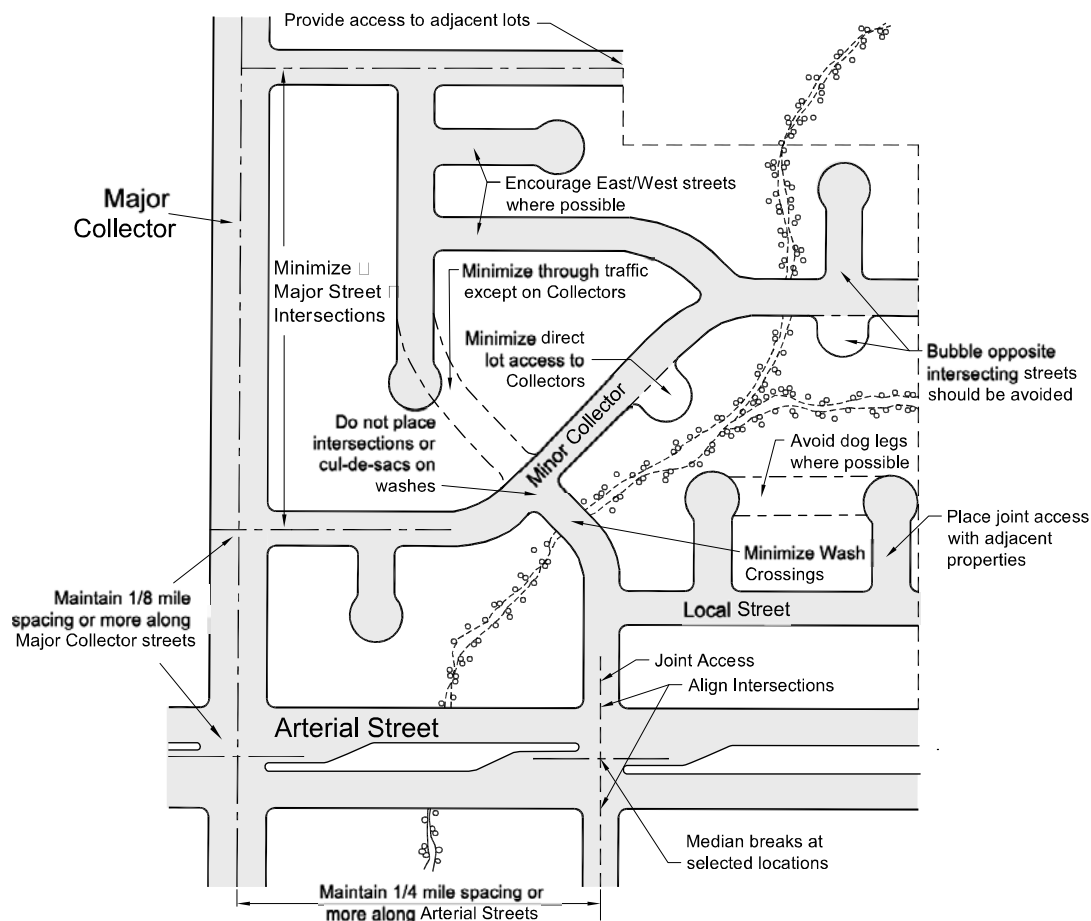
SUBDIVISION STREET PLANNING
